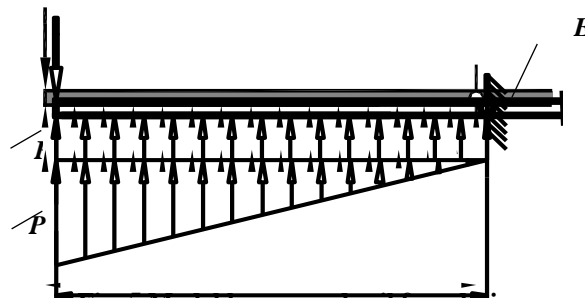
Model beams and soil foundation. asymmetric task. Concentrated load N. Installed on its edge.
